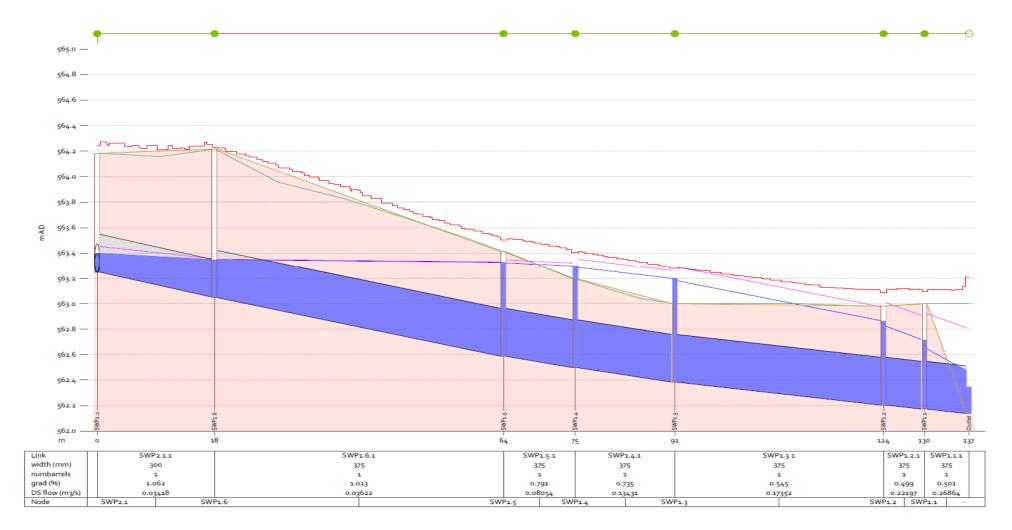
5% AEP water profile for stormwater drainage long section between pits SWP2.1 to the outlet in Yass Street
